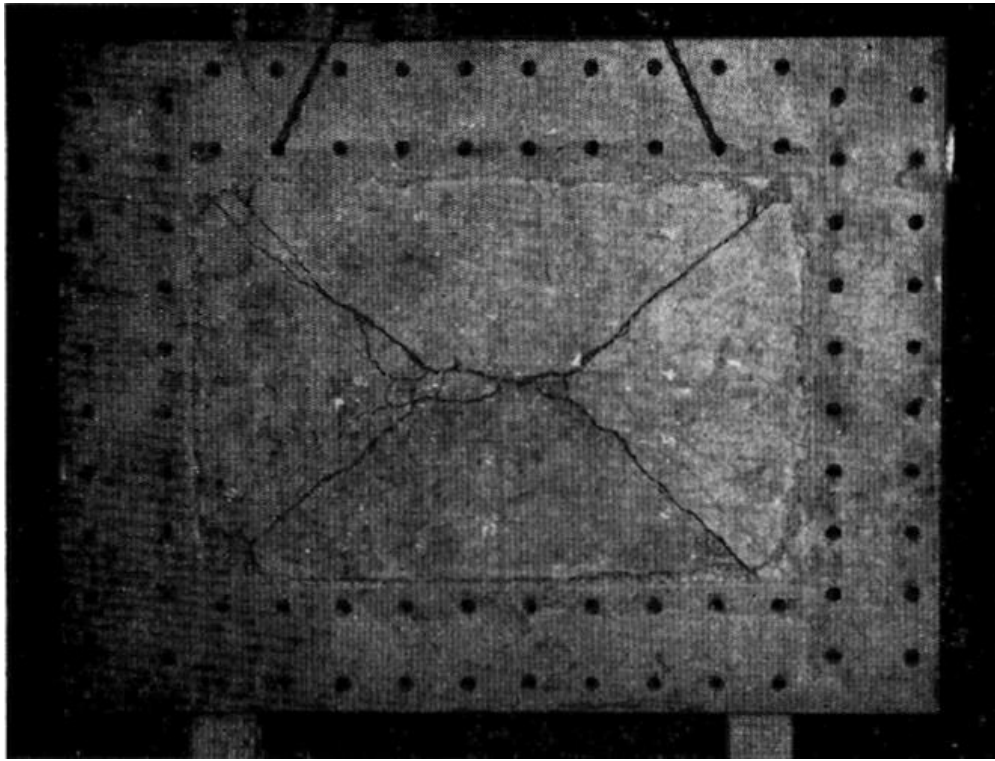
Cracked concrete slab. (From Park et al. (1964))
